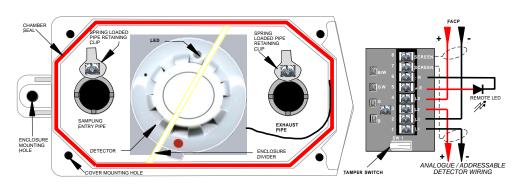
Cutaway View of the Enclosure, Terminal Block & Wiring Diagram
